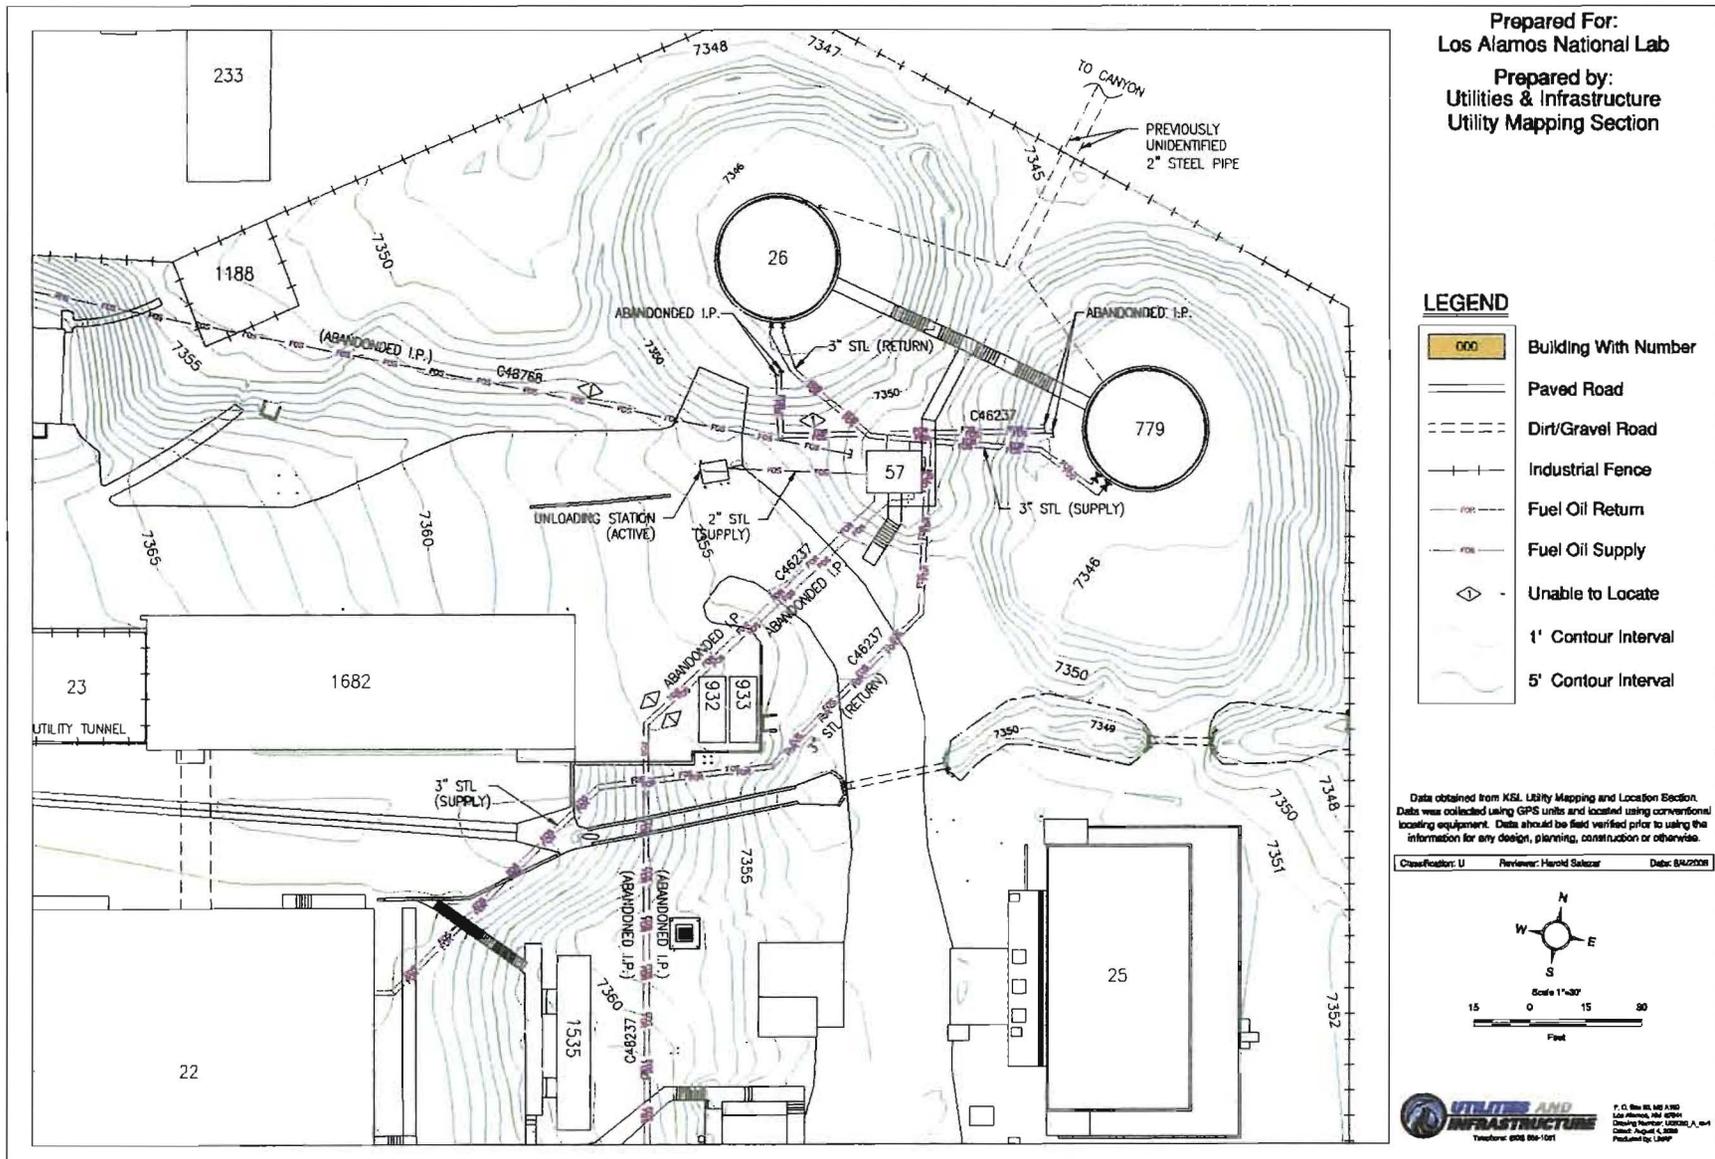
Layout of Tank TA-3-26 and Nearby Facilities.
